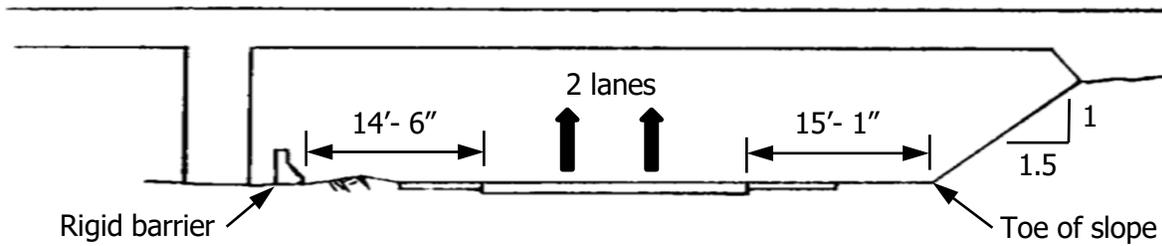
Bridge elevation view of horizontal clearances for a 2-lane, 1-way highway feature below the bridge, with a rigid barrier.
